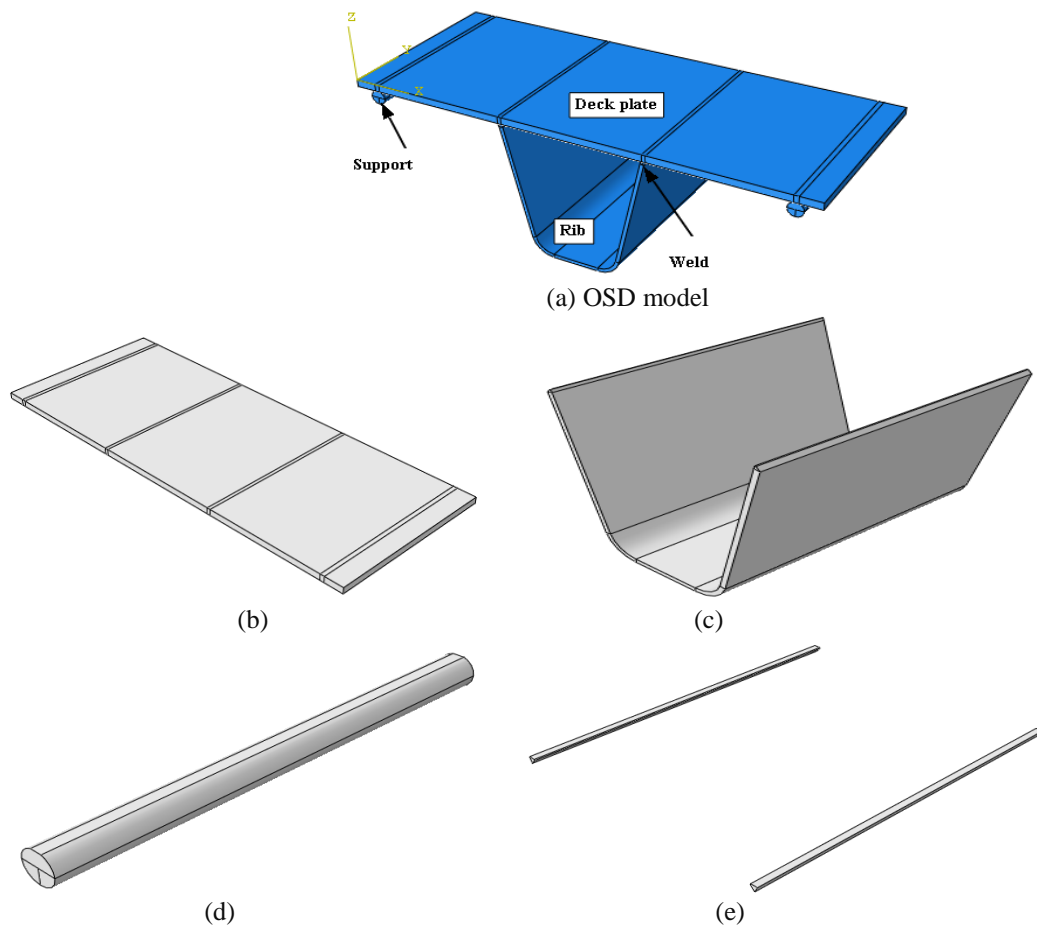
(a) The entire OSD model and its four parts are: (b) deck plate (c) Rib (d) Support (e) Weld
